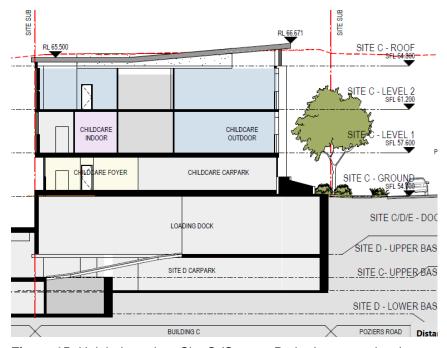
Height breach to Site C (Source: Rothe Lowman plans)
